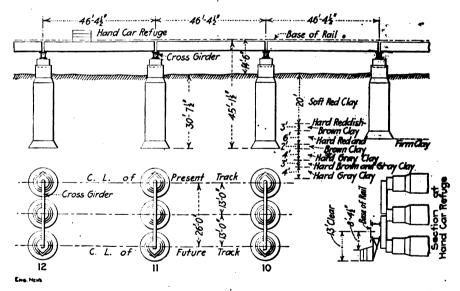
Plate Girder Bridge with Cylinder-Caisson Piers over Little Lake Butte des Morts, Wisconsin; Chicago & Northwestern Ry.
